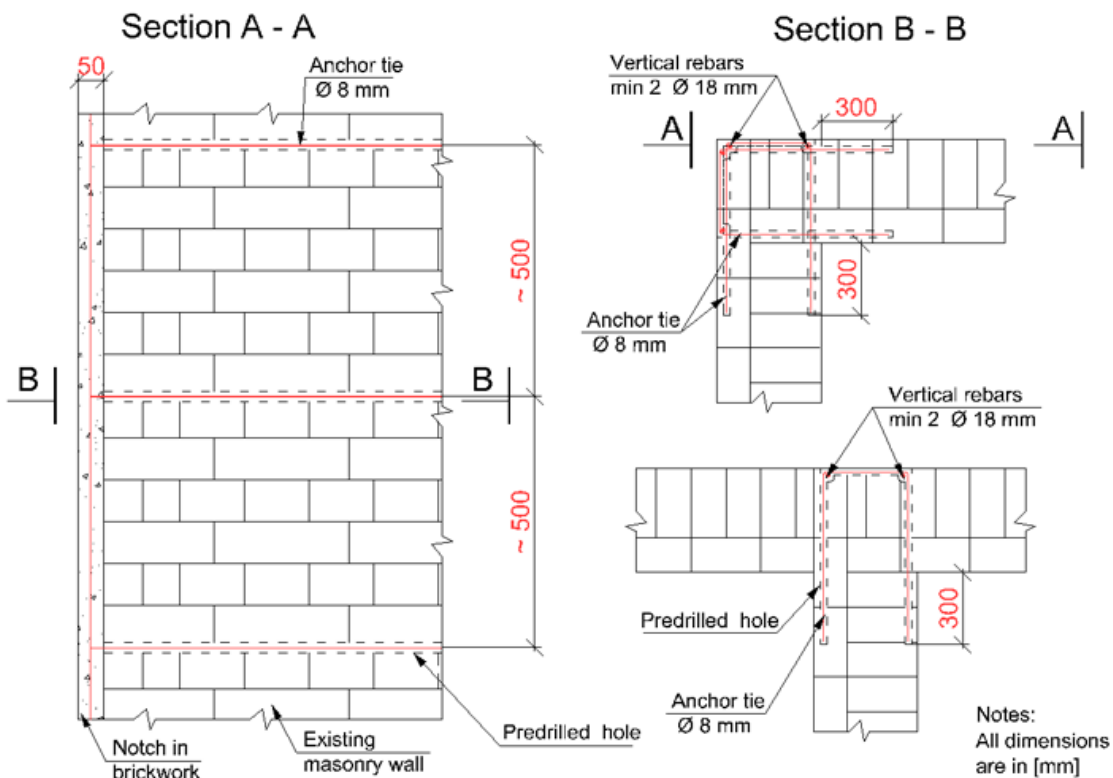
Detail for confining of masonry walls vertical steel ties [45]
